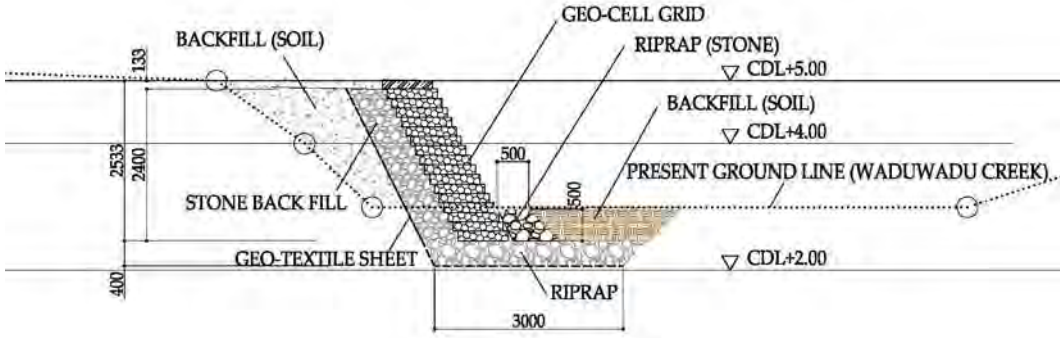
Typical Section of a Geo-cell Retaining Wall Construction
